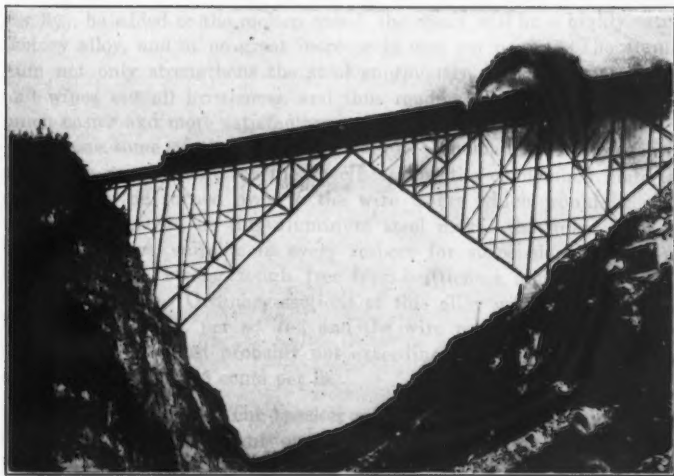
SWITCHBACK ARCH. WHITE PASS AND YUKON RAILWAY, ALASKA.
